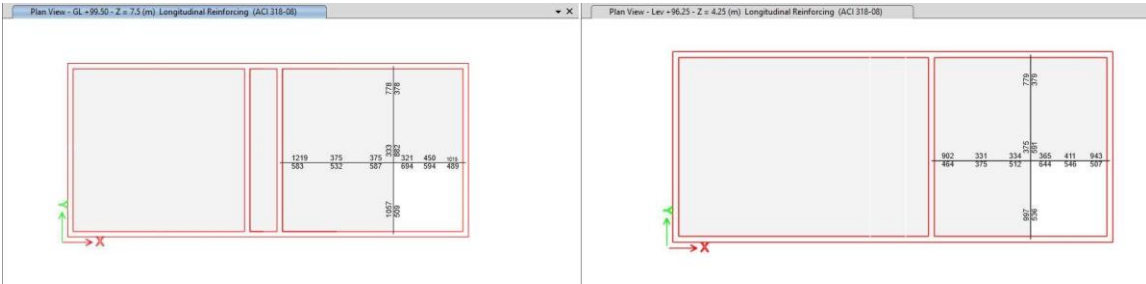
Longitudinal Reinforcing Detail (mm²)
